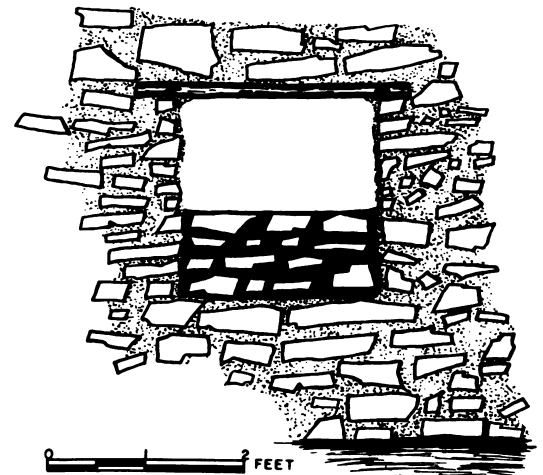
Details of typical partially filled doorway, reducing the opening to "window" size.
